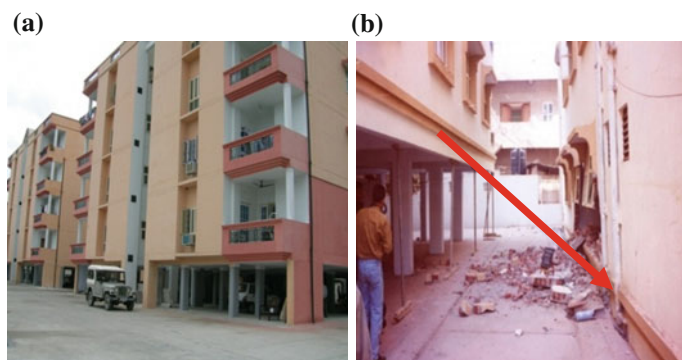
a Typical Indian multi-storey buildings with ground storey kept open for parking; b failure due to soft/weak storey phenomenon in an open ground storey building during 2001 Bhuj earthquake
